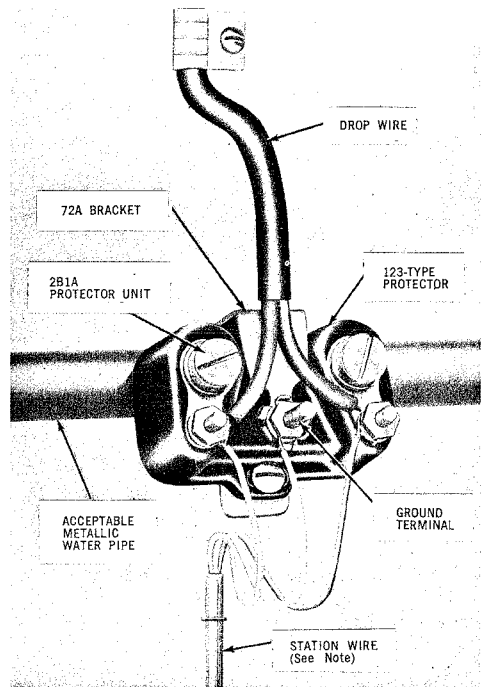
123 Type Protector Installed With 72A Bracket
